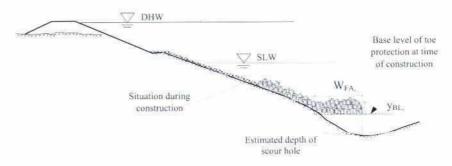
Toe protection of a revetment for under water construction (schematic)
